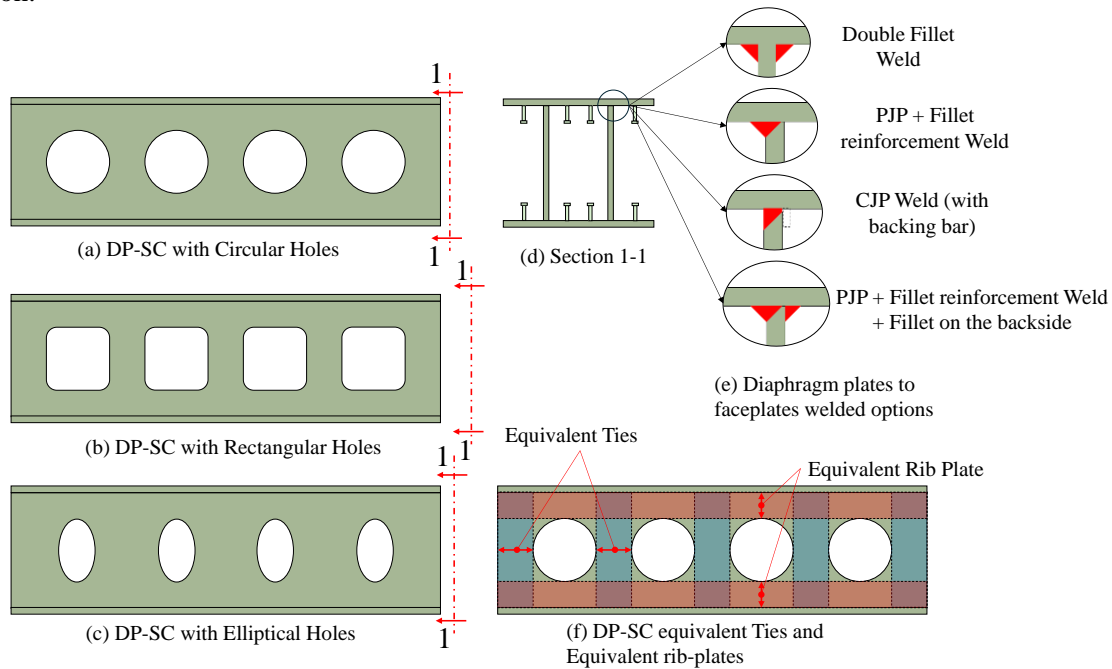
Concrete flow holes layout and diaphragm plate to faceplate welding options.
